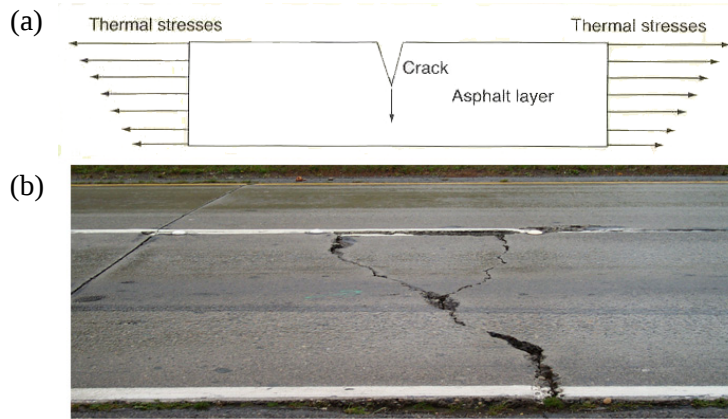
(a) Thermal stresses behind cracking phenomenon in a pavement layer. (b) Cracks arising on a pavement surface.
